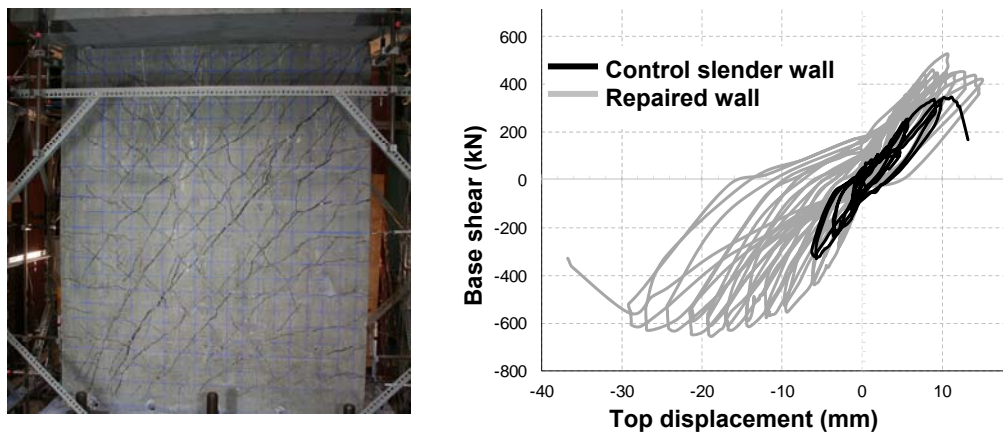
Diagonal tension failure in slender wall with insufficient shear reinforcement (left); performance of the same wall with flexural and shear FRP reinforcement (right)
